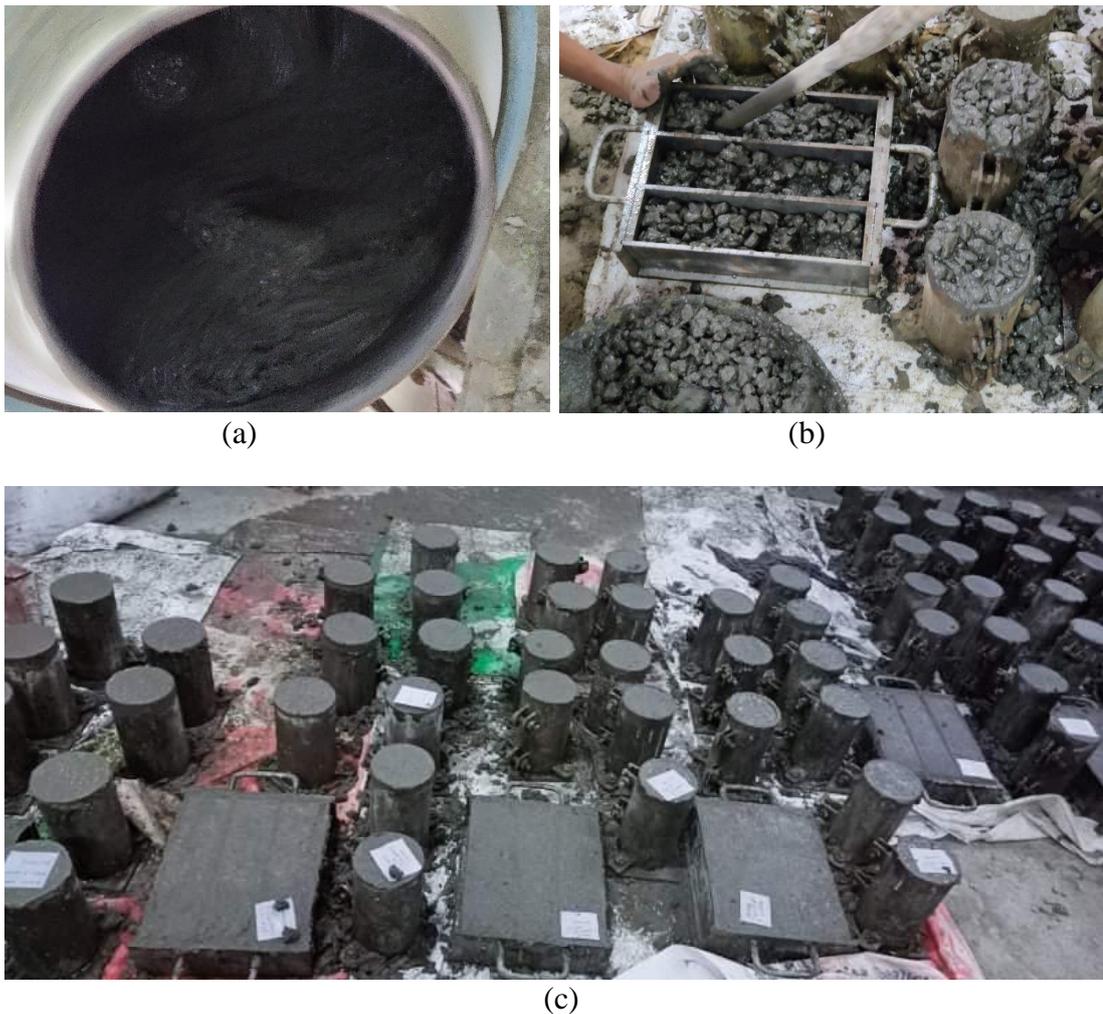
(a) Mixing of Concrete; (b) Compaction of Concrete and (c) casting of Concrete specimens
